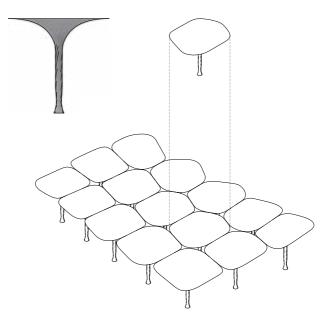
Parametrically designed formwork columns using twisting and various extrusion widths, shaped to match the roof structure.
